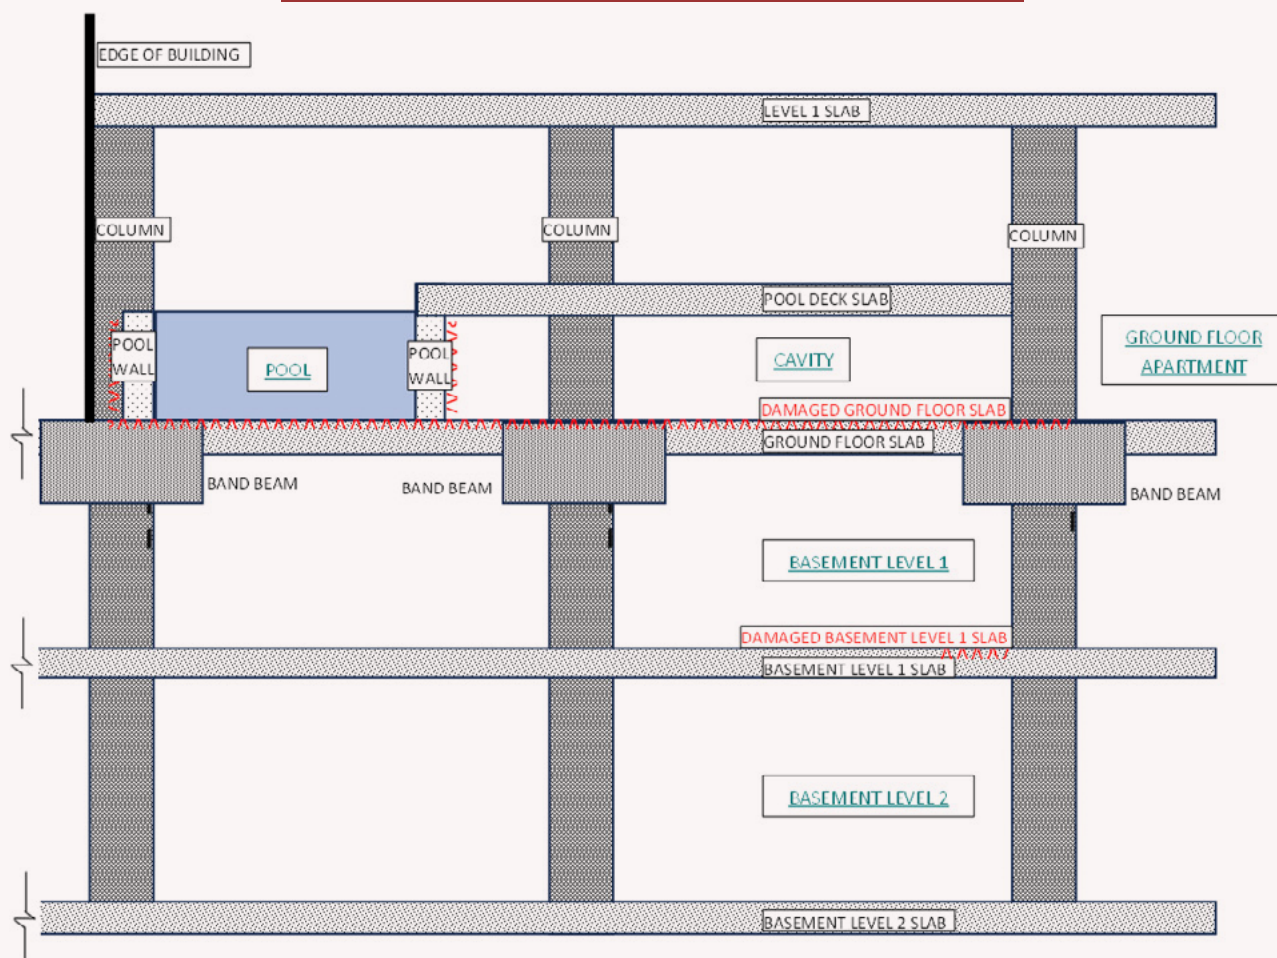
Cross-section of building showing slabs, columns and band beams. The pool sits on a post-tensioned slab, between two band beams. Typical slab thickness 200 mm and band-beam thickness of 450 mm.
